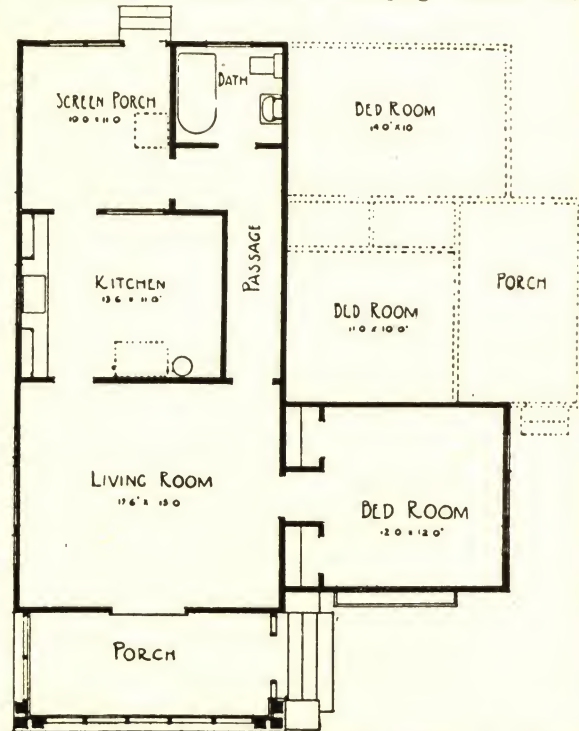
Floor Plan Showing Possible Addition in Dotted Lines
